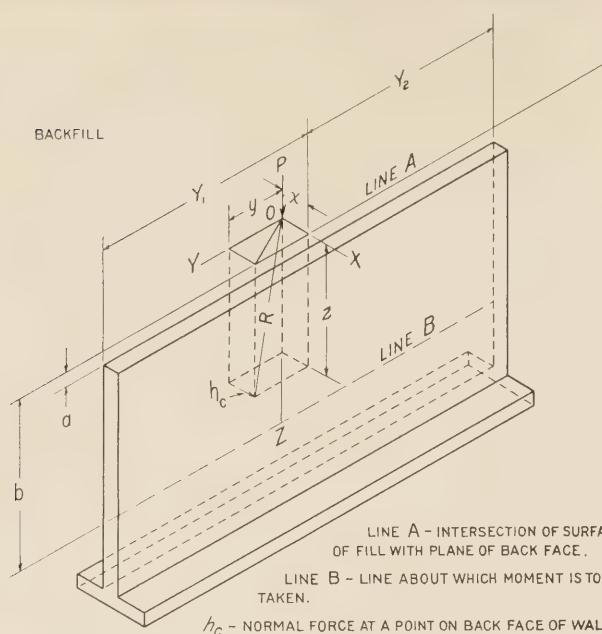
DIAGRAM SHOWING RETAINING WALL AND LOAD ON BACKFILL.
